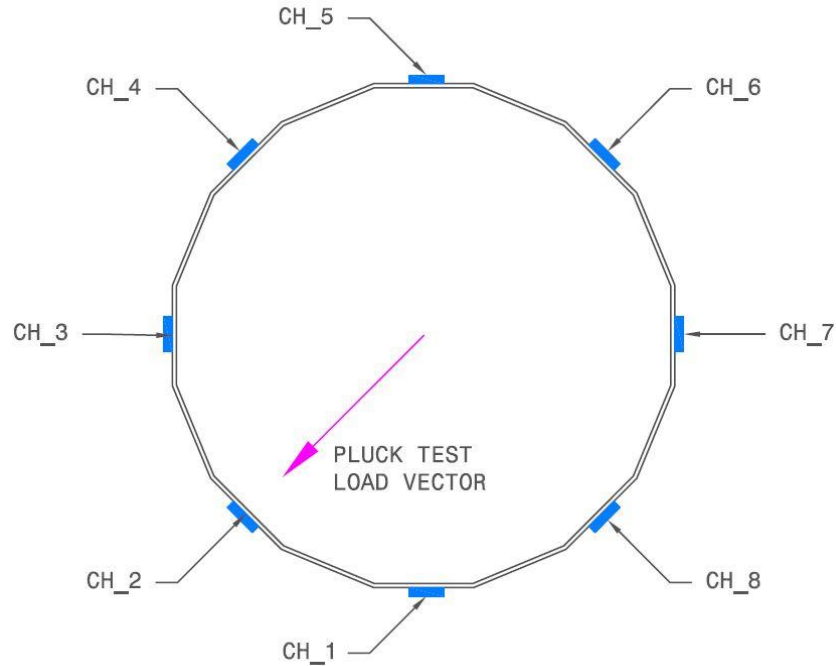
Sketch showing installation of strain gages on tube wall cross-section
